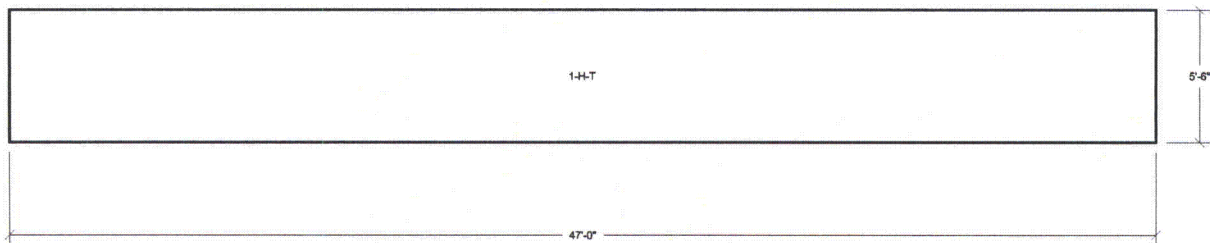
H.7-14: Tunnel Walls Looking From Outside
